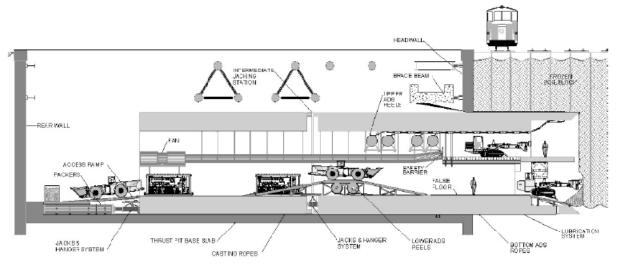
Layout of a tunnel jacking site<sup>57</sup>
